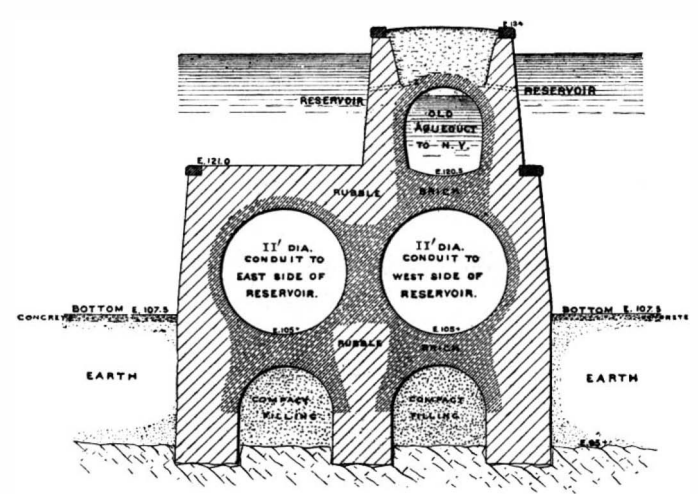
SECTION THROUGH DOUBLE CONDUIT BELOW MAIN GATE HOUSE.
